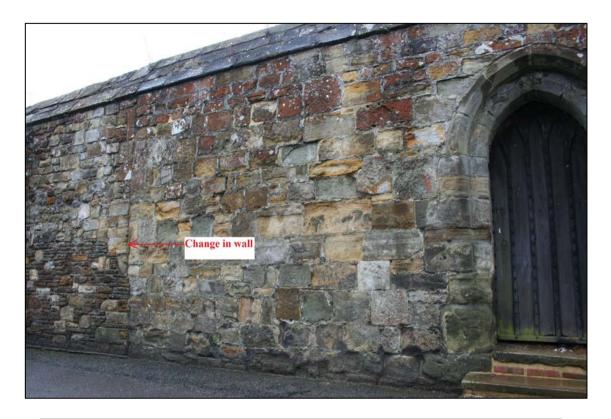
Upper Lake Zebra Crossing: Photograph showing the change in precinct wall construction
